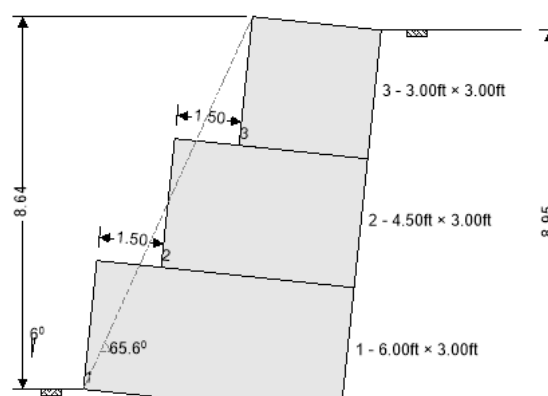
Geometry of Gabion Retaining Wall using Tekla Tedds
